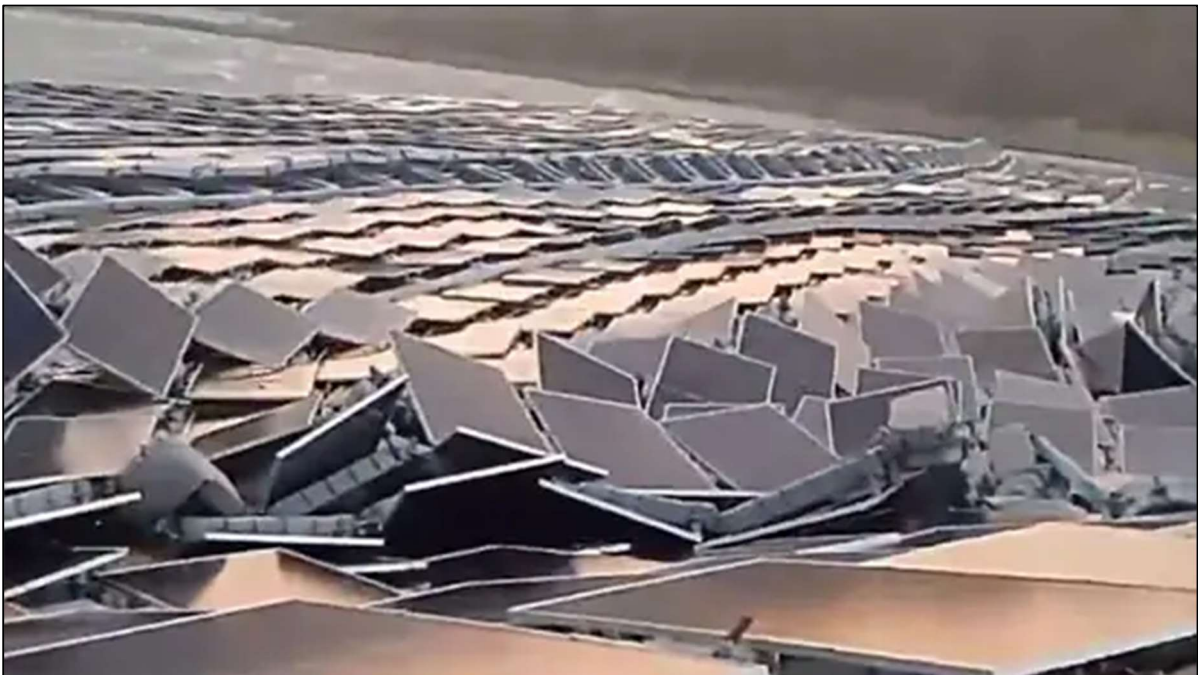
Storm damages the world's largest floating solar plant in Madhya Pradesh, India – note this was being built on the backwaters of Omkareshwar Dam, not at sea (ref. Hindustan Times, Sun, Oct 12, 2025).
